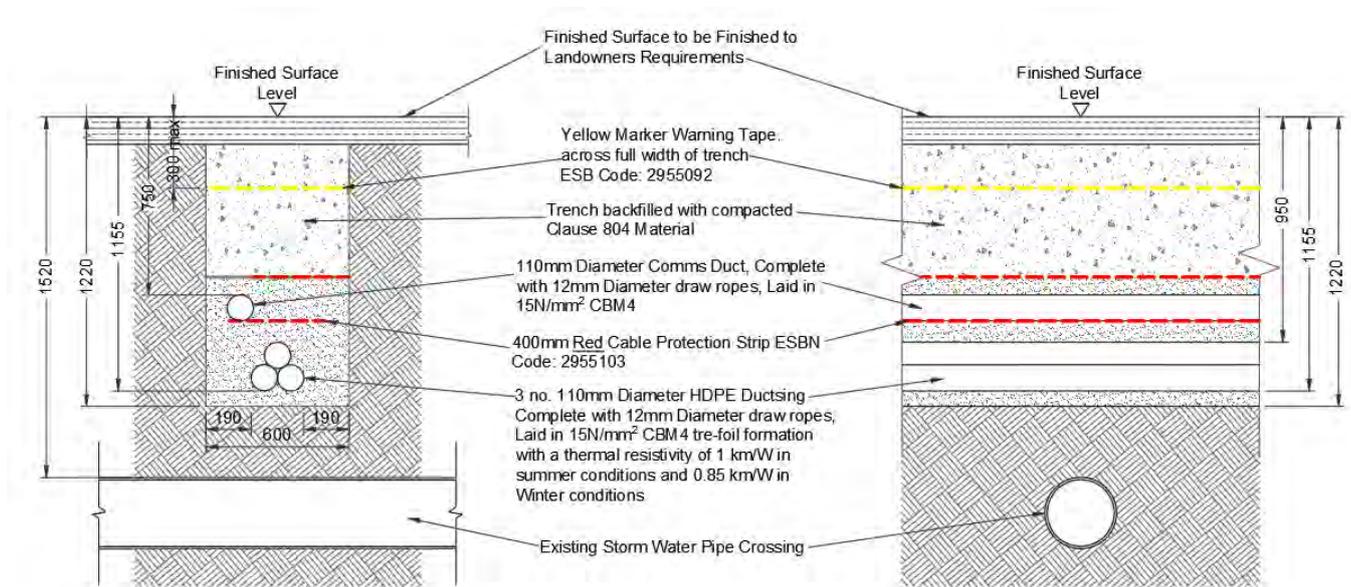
Piped Culvert Crossing – Ducting Over Culvert Crossing Details
